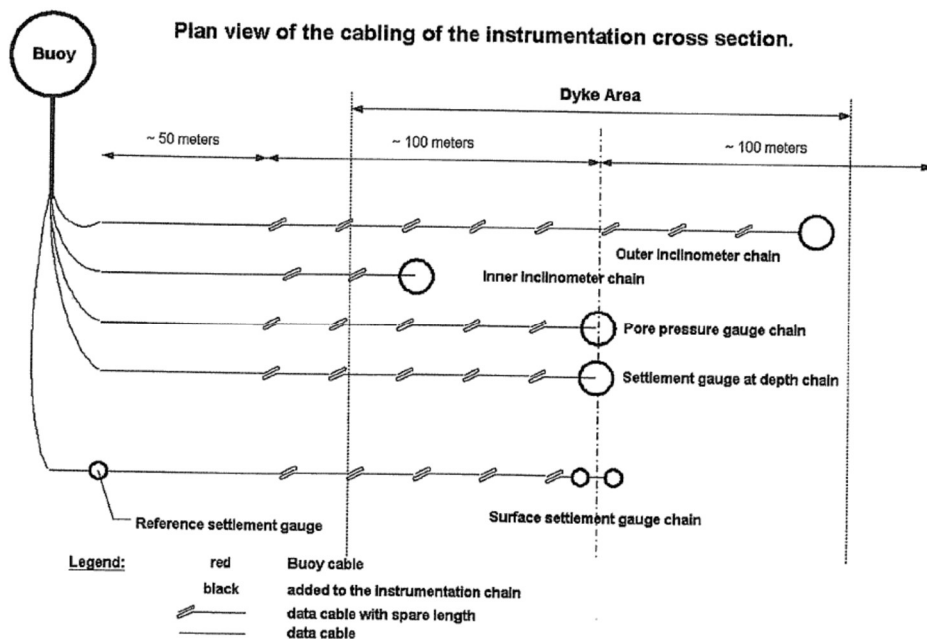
Plan view of the cabling of the instrumentation cross-section
